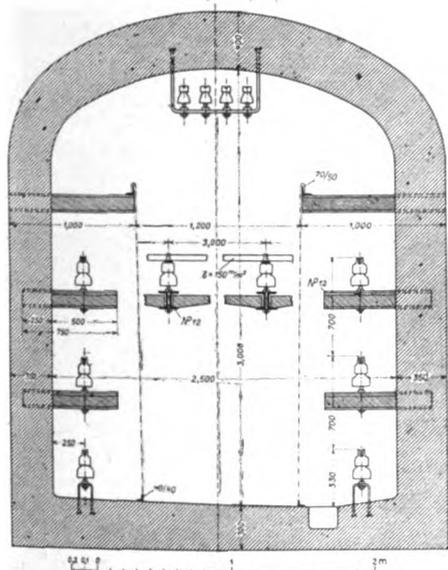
CROSS-SECTION OF CABLE TUNNEL LEADING ACROSS BOUNDARY, BETWEEN POWER-HOUSE AND STEP-UP TRANSFORMER STATION, BRUSIO HYDROELECTRIC PLANT.
